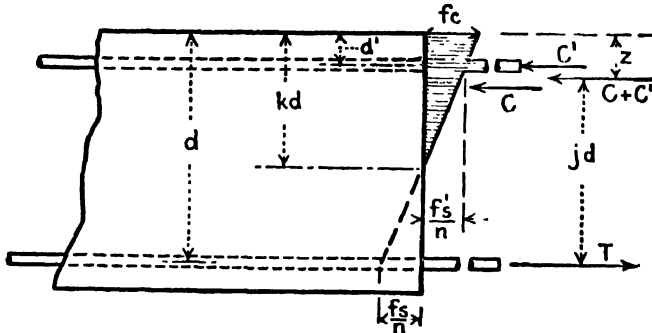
Nomenclature for concrete beam reinforced for tension and compression.
